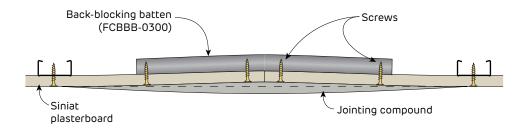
Creating a Recess on a Ceiling Butt Joint using Back-Blocking BattensSection
